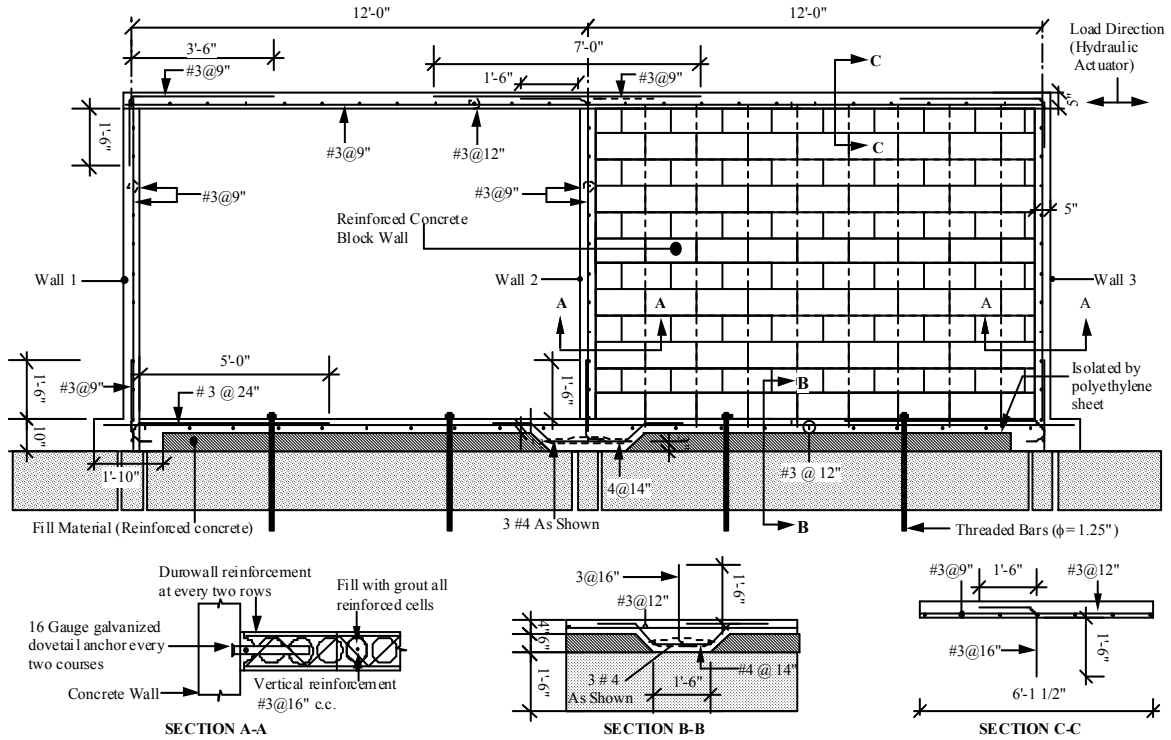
Details of dimensions, reinforcement and foundation for Specimen 3
